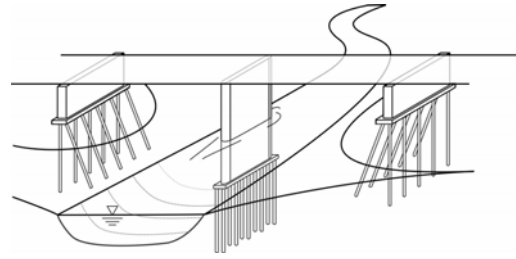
A concrete spillway constructed to stop knickpoint migration, Willow Creek in Harrison County, Iowa. The weir and bridge abutments form what in Iowa is known as a "Greenwood Bridge"
